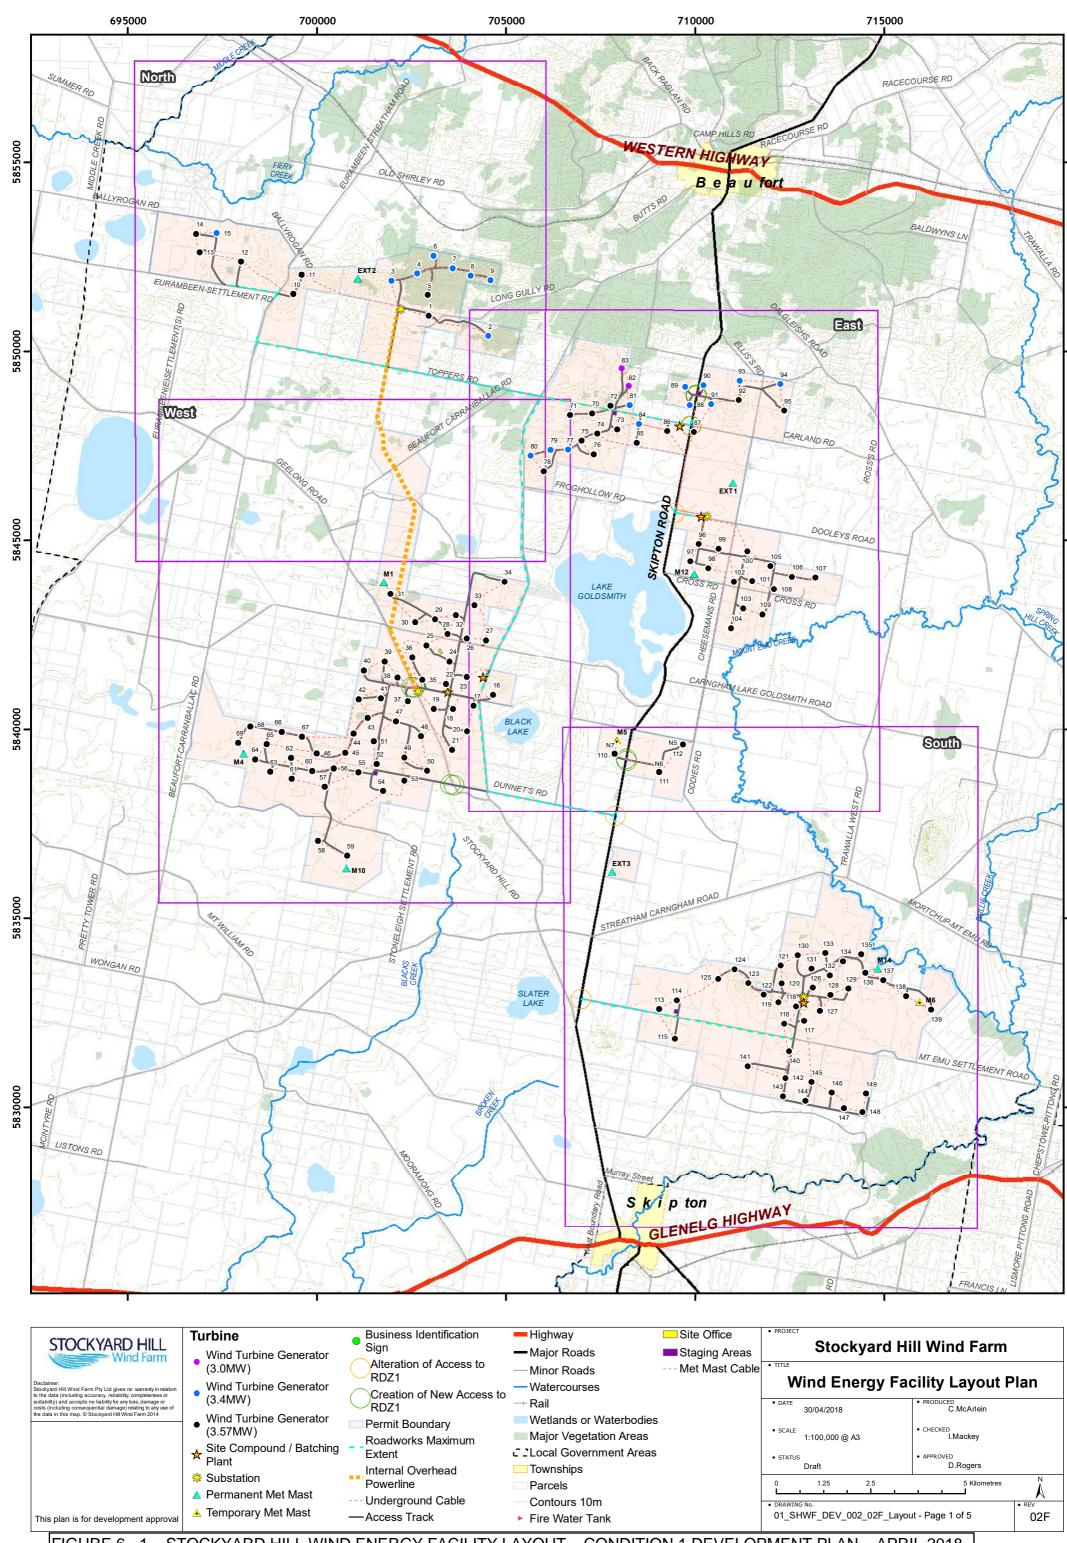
1 – STOCKYARD HILL WIND ENERGY FACILITY LAYOUT – CONDITION 1 DEVELOPMENT PLAN – APRIL 2018
